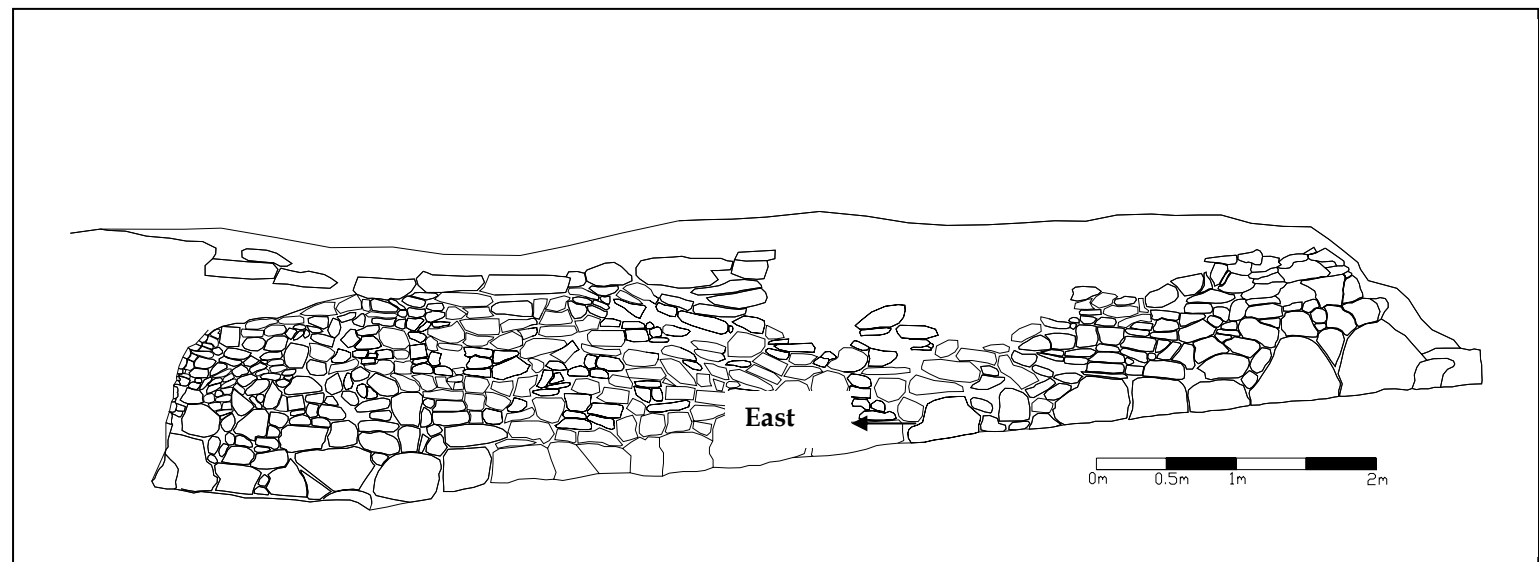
Wall F elevation, north wall of gallery 3 (Grid Point solutions with additions)
